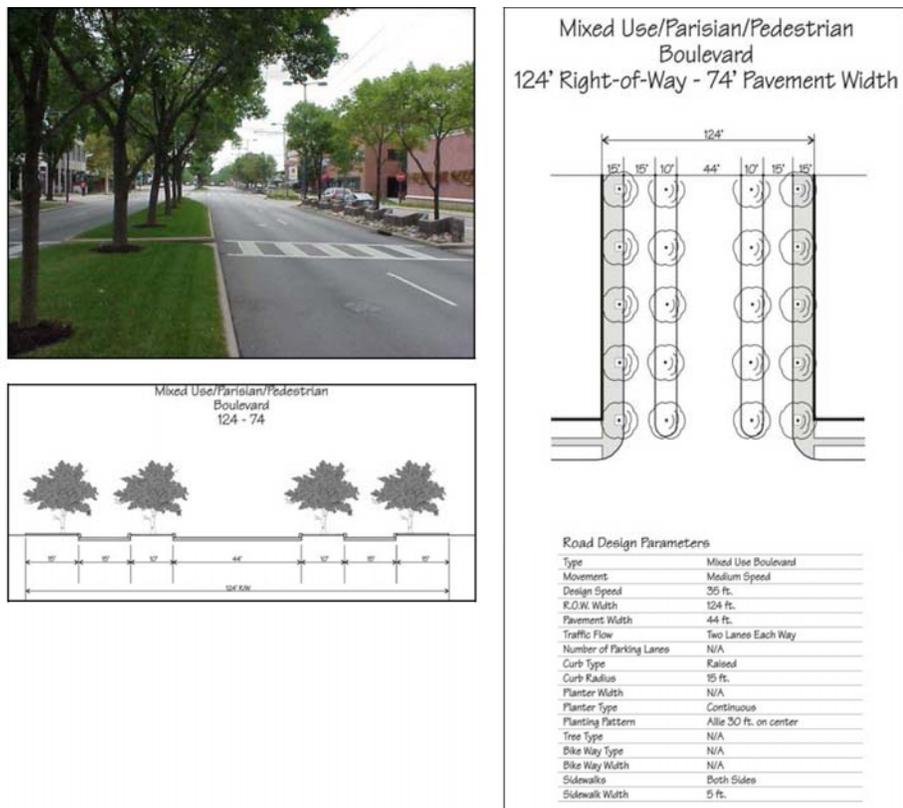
EXAMPLE OF A MIXED USE STREET DESIGN FROM THE GARNER COMPREHENSIVE GROWTH PLAN
